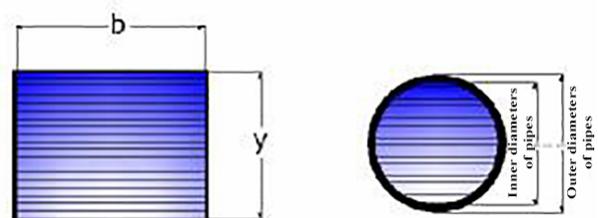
The cross sectional area of the flow in the pipe (waterway) and bridge (culvert)
